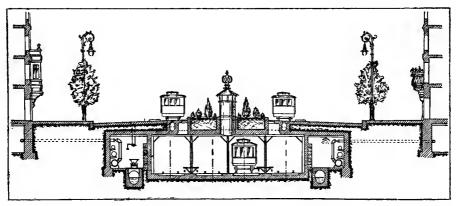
cross section of metropolitan residential street with express and local subway railways, general utility service tunnels and street railways on both sides of a floral area
